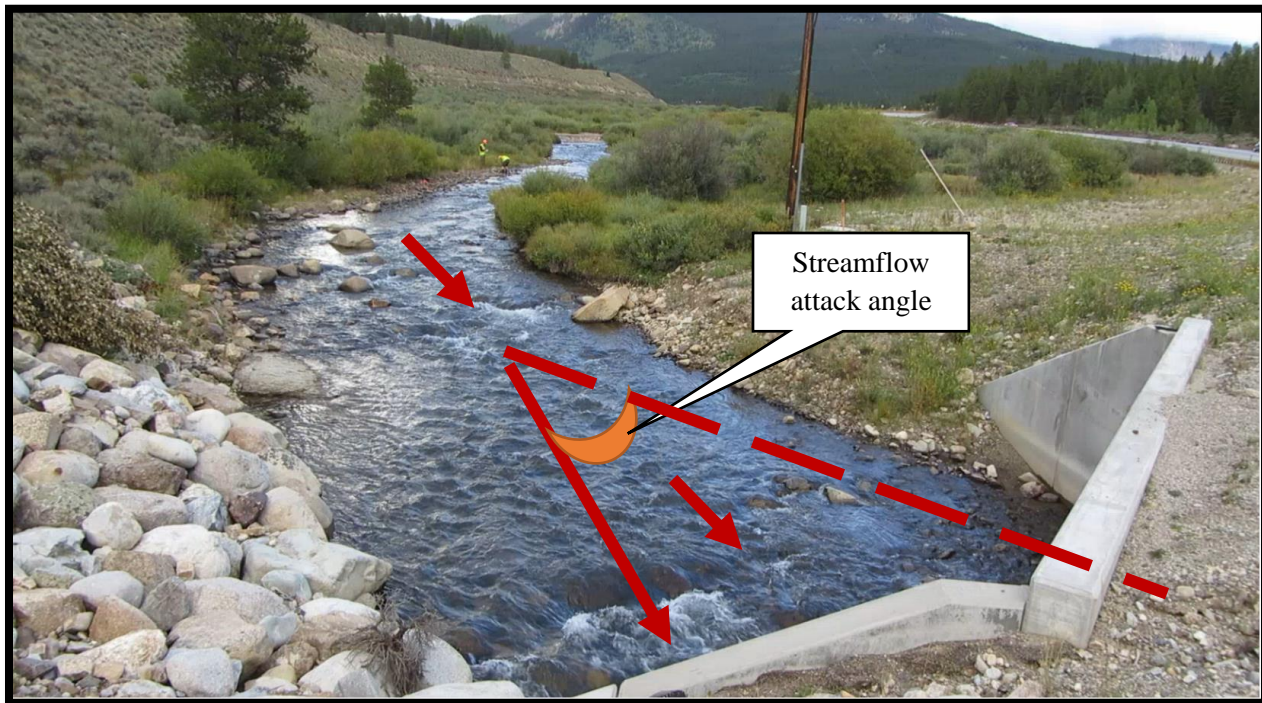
This figure shows a stream in the state of Colorado, USA. The stream flow is attacking the right wingwall of this concrete box culvert. The rock (riprap) has been placed at the end of the wingwall to protect the end of the wingwall from erosion.
